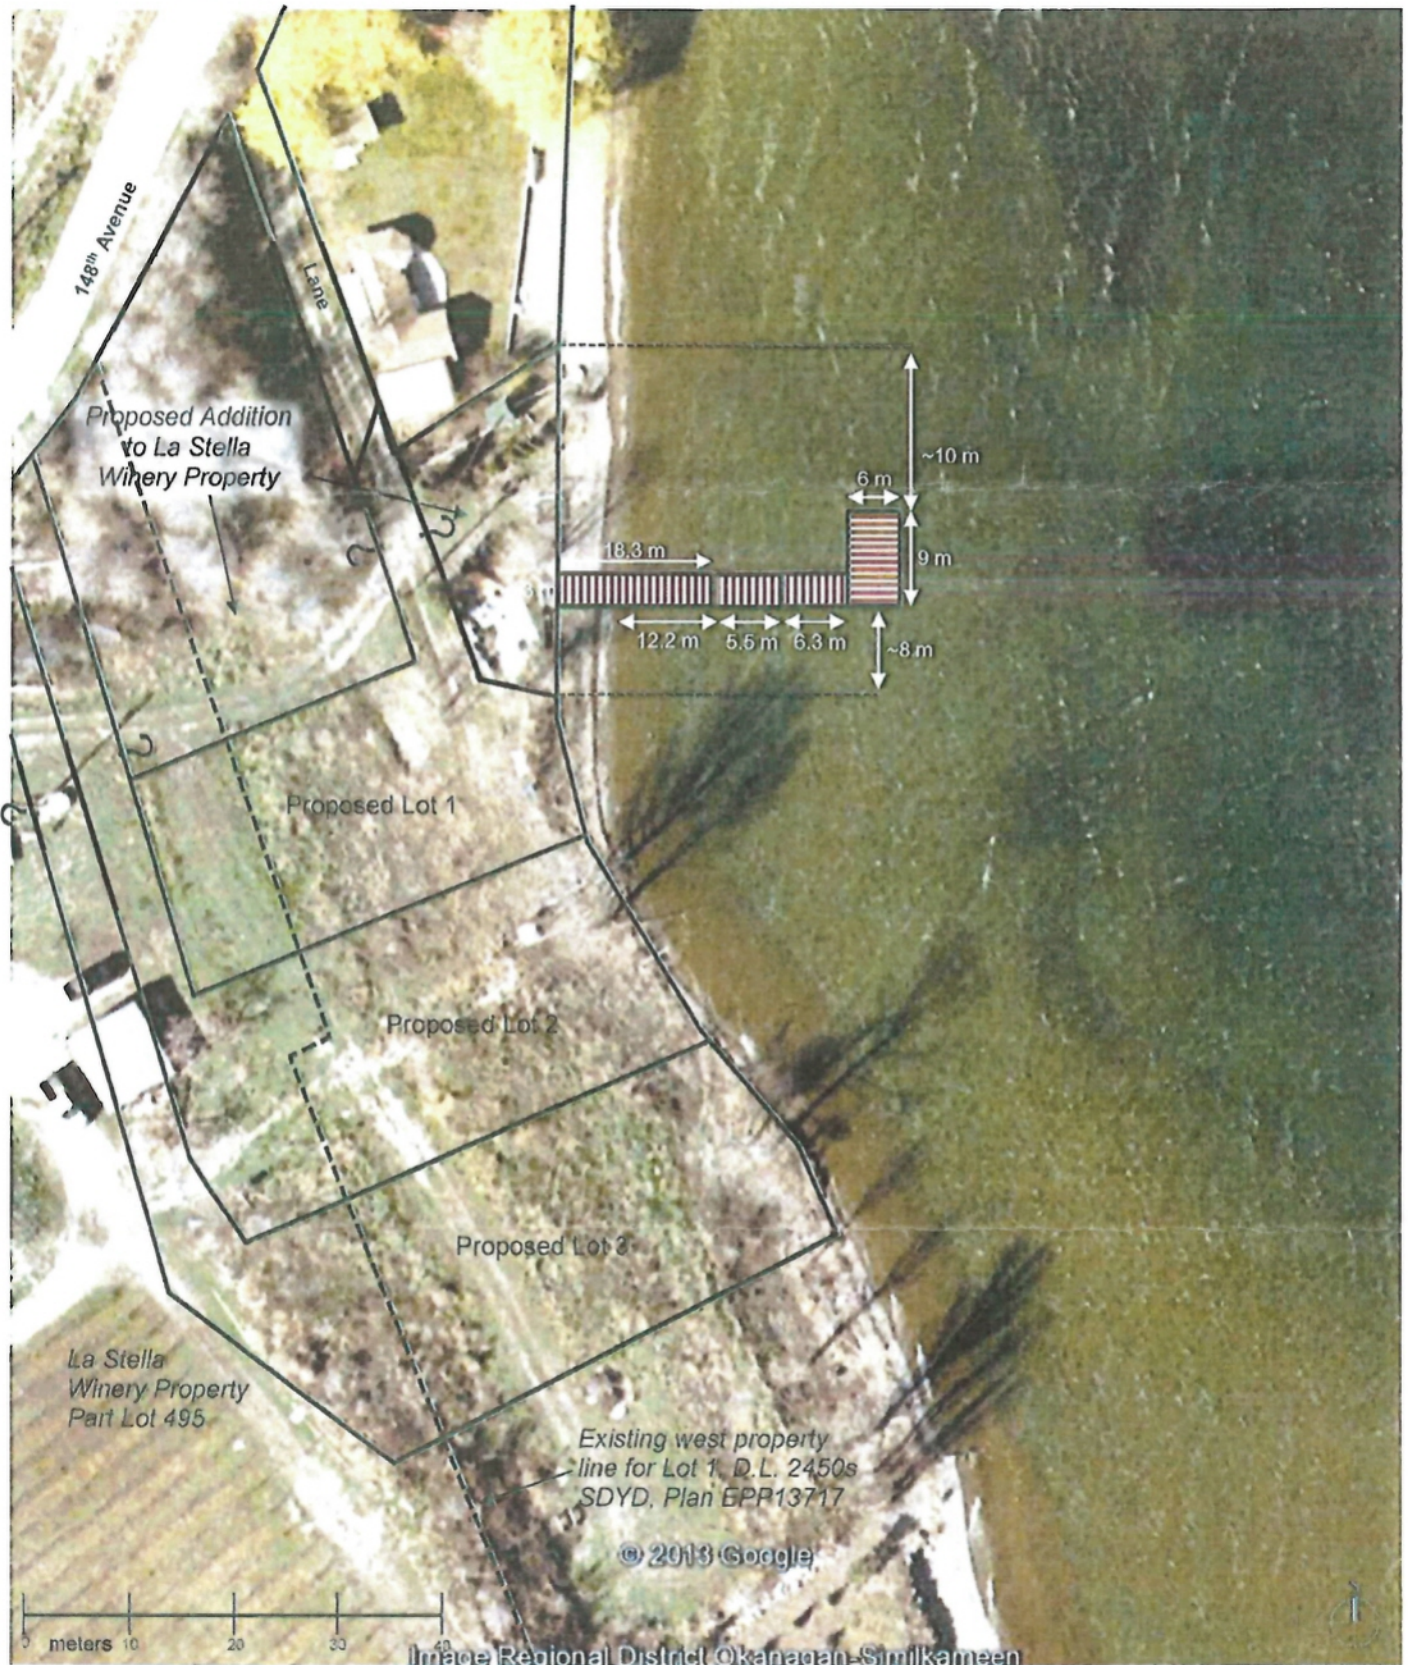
Proposed Dock Dimensions and Details – Plan View
